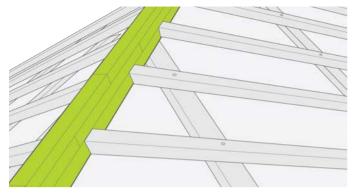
FIXING BATTENS FOR A BEV-ELED RIDGE
